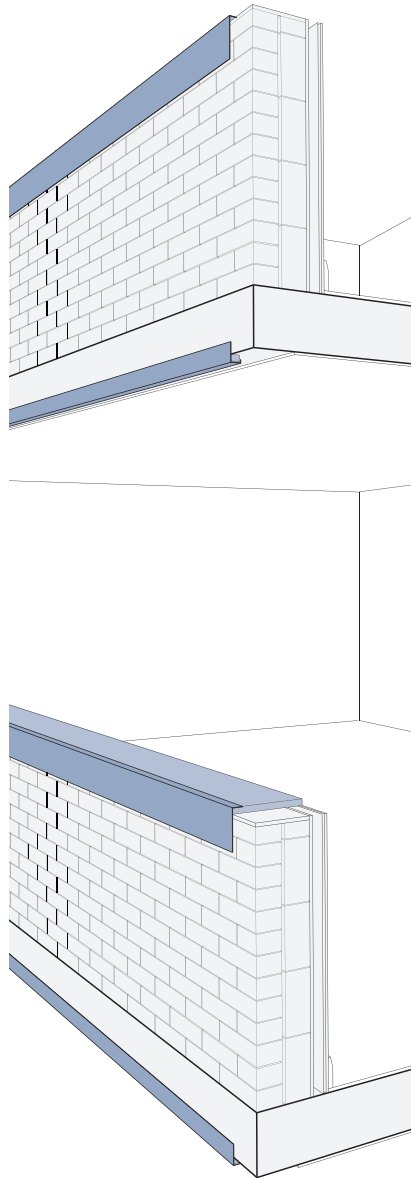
The process of panel system wall overcladding and window replacement begins with the removal of the existing window(s). The existing rough opening has blocking installed on the window sill, followed by the placement of air/vapour barrier membranes that will subsequently overlap and tie into the air/vapour barrier system. Normally, this process begins at the top of the building and proceeds downwards so that debris and falling objects do not damage the newly installed components below. Note that the backing on the air/vapour barrier strips is retained until these later overlap and tie into the wall air/vapour barrier, unless a spray polyurethane foam insulation is employed.
